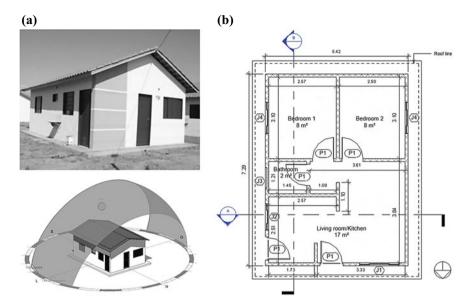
a House photo and 3D model representation with solar chart; b Floor plan (dimensions in meters)
